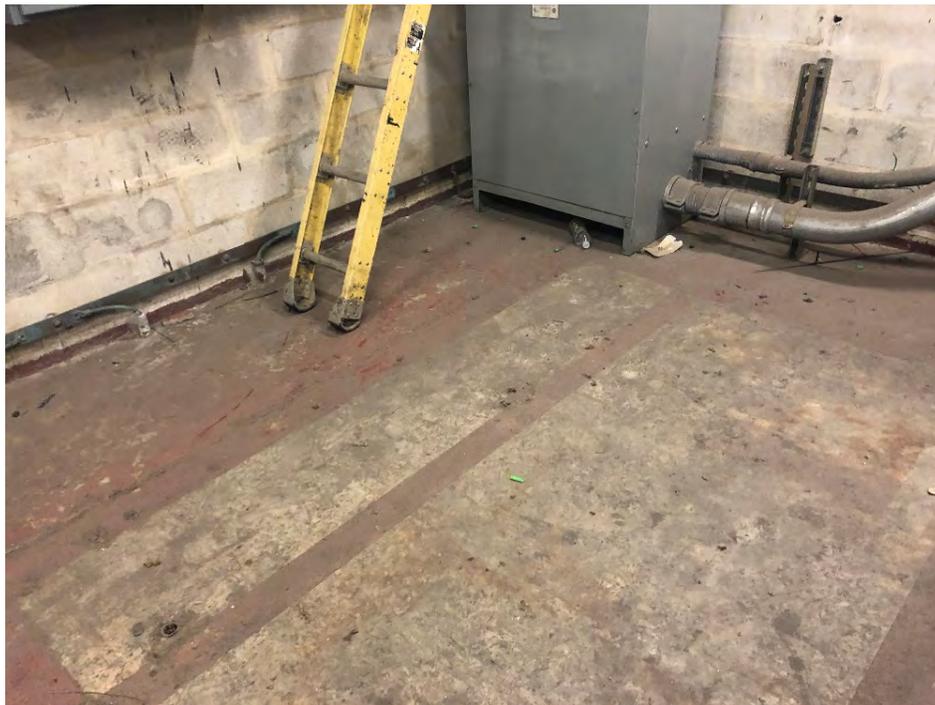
Test Pit TP-293-1 prior to excavation (facing north)
